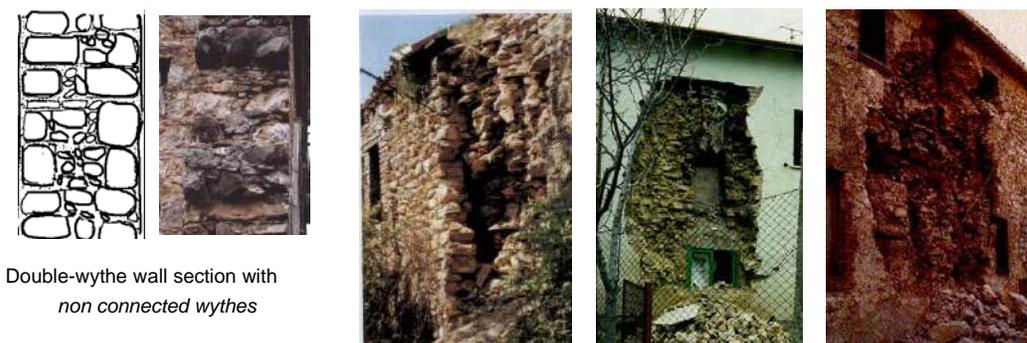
Masonry wall with non connected or badly connected wythes, as highlighted by the disastrous collapses due to the earthquake (Ps)
